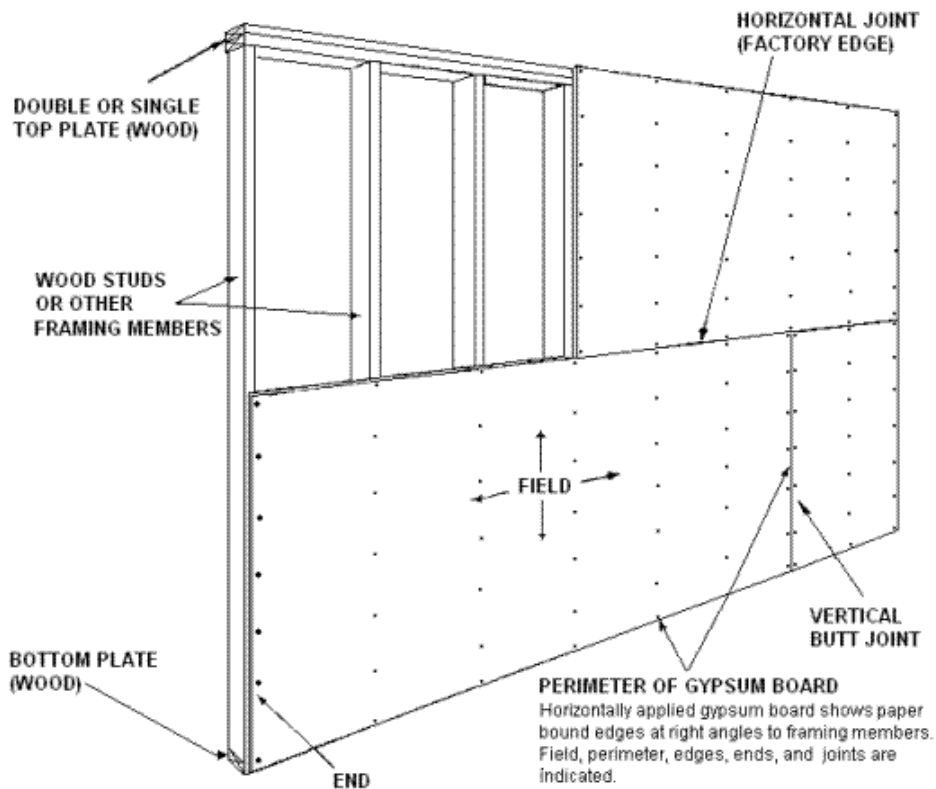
Schematic drawings and sketches for drywall installation works
